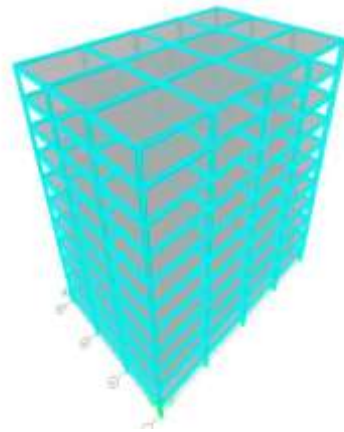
Model 2: G+10 RC bare frame building with slab element 3D view
